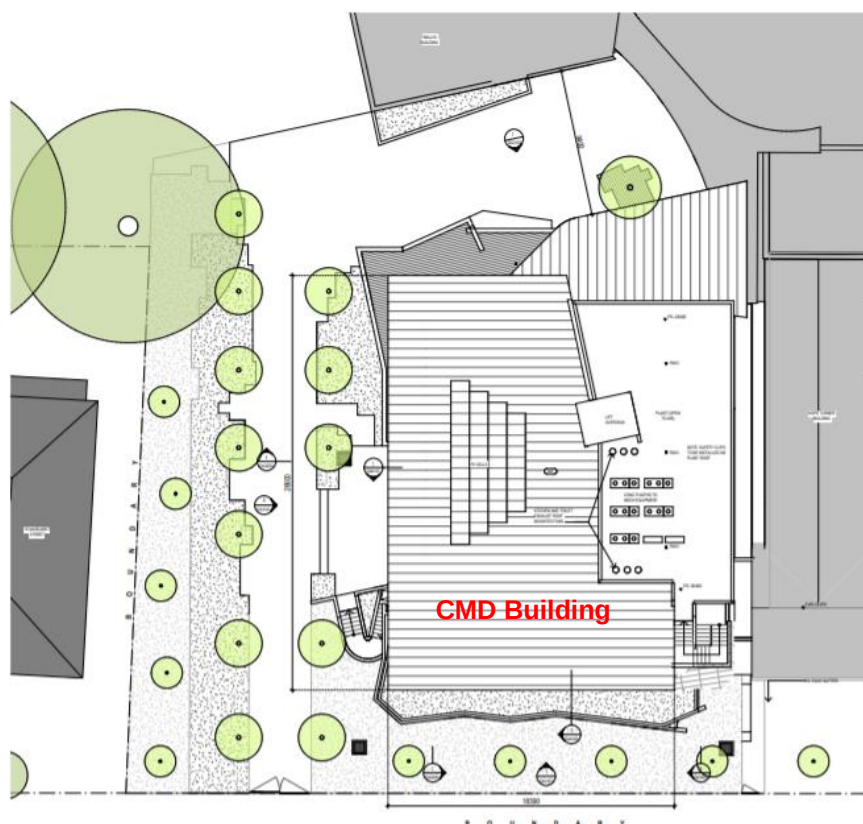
| Senior School Campus: CMD building and landscape as approved by SSD 9692 (Source: Applicant's EIS SSD-9692 2019)
